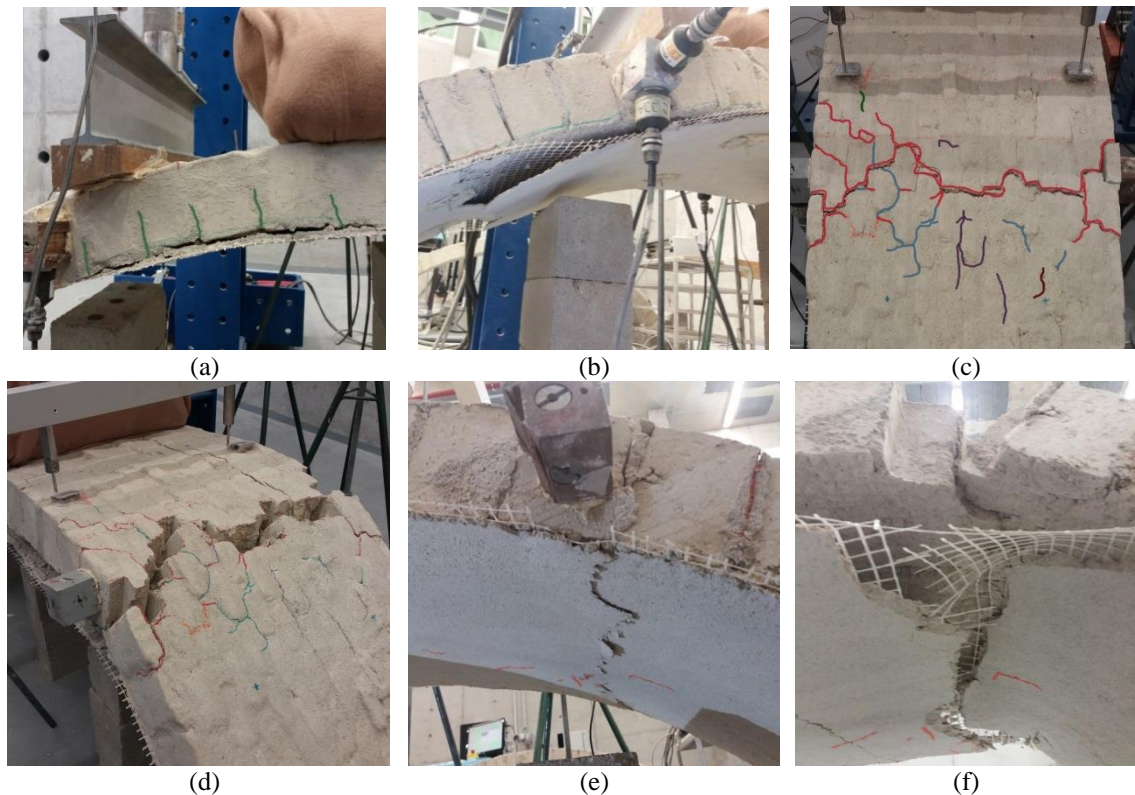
Damage development of the vault models strengthened at the intrados: (a) cracks at section F (SI1); (b) detachment of the strengthening mortar at section F (SI2), (c) cracks at section G before collapse (SI1); (d) cracks at section G after collapse (SI1); (e) mortar crushing at section H (SI2); (f) rupture of fiber-glass mesh at section H (after collapse) (SI2).
